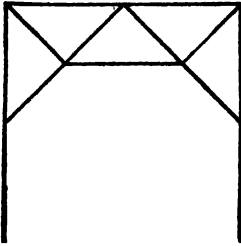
Outline of Sway Bracing Frame for Through Bridges with Parallel Chords.
